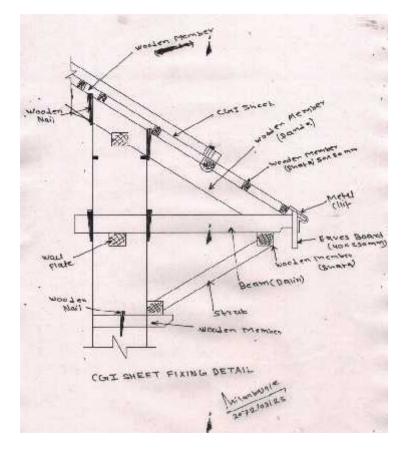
CGI sheet fixing Detail (Sketch drawn on site, 2015)
